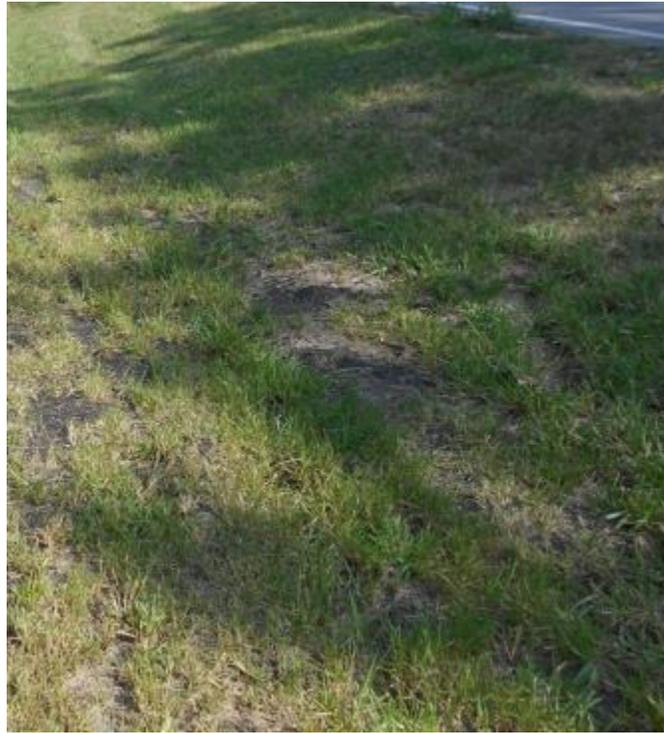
Route DD TRM unraveling from culvert scour.
